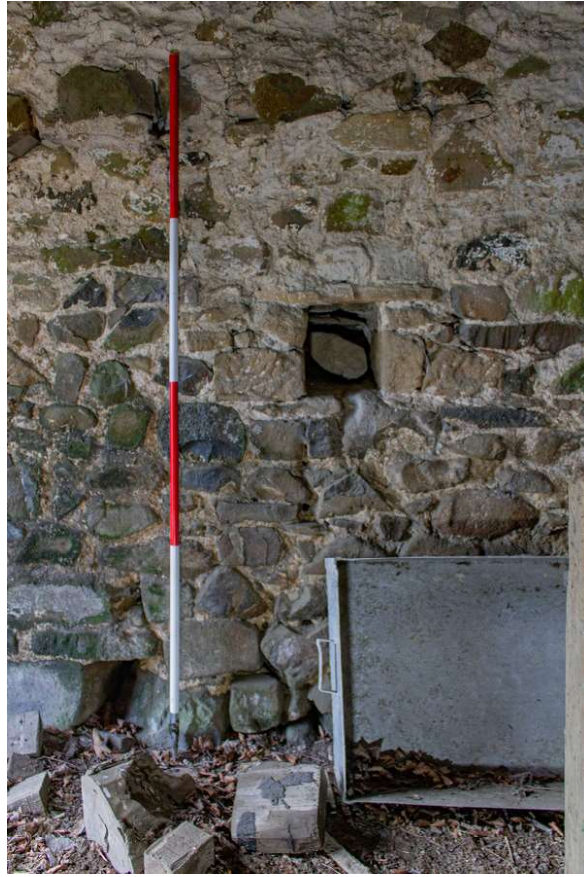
(53): Building B (Barn), Barn B1, detail of the small opening in the centre of the south-west elevation, from the north-east
